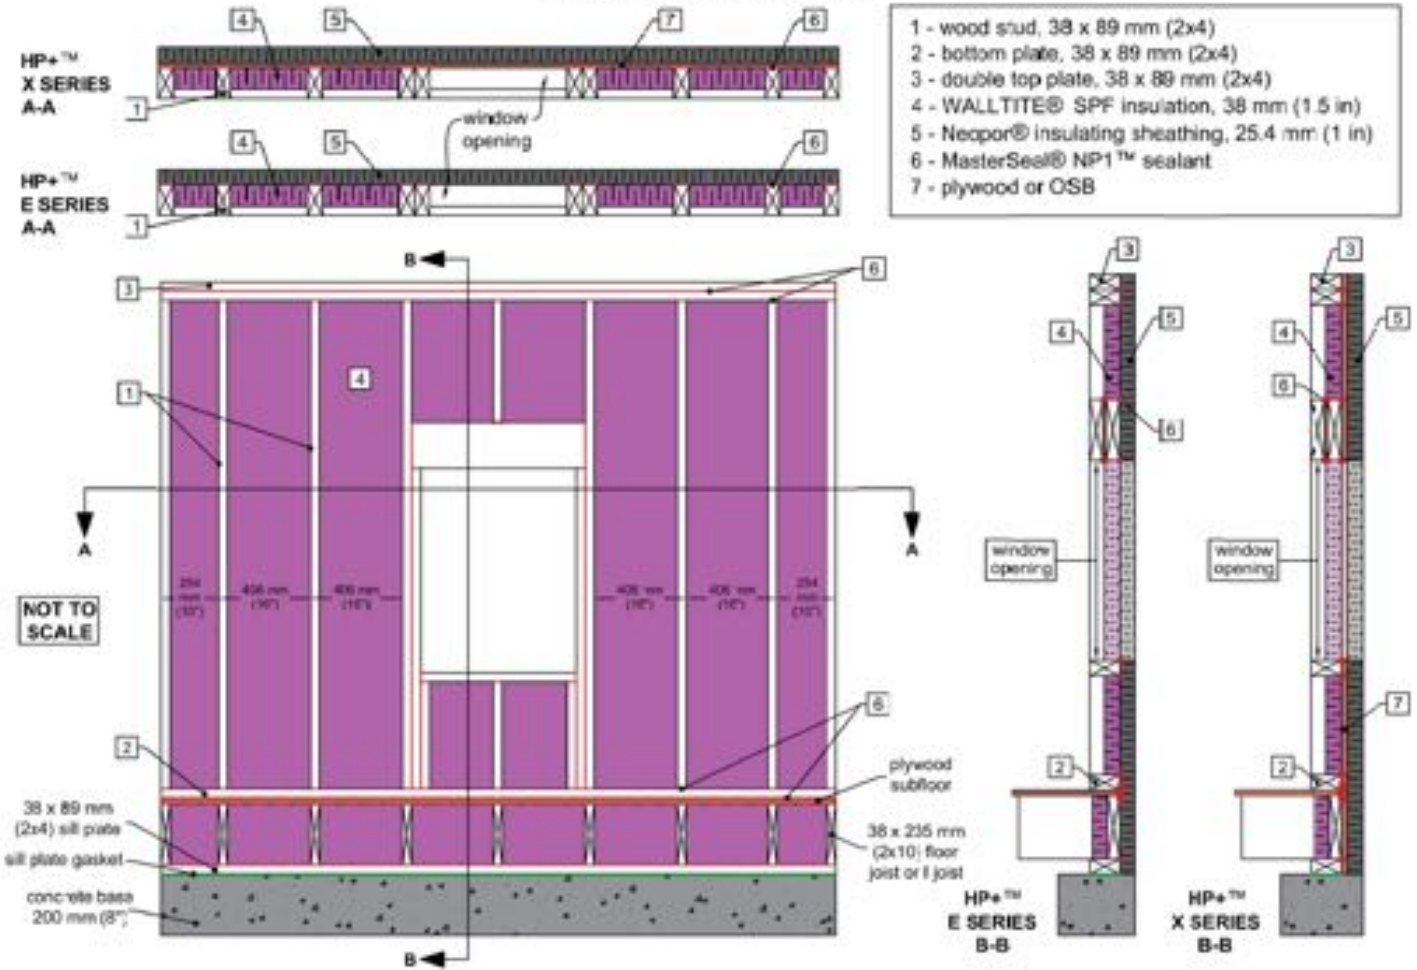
Tested wall specimens “HP+™ E” and “HP+™ X Series” with windows, floor and concrete base
